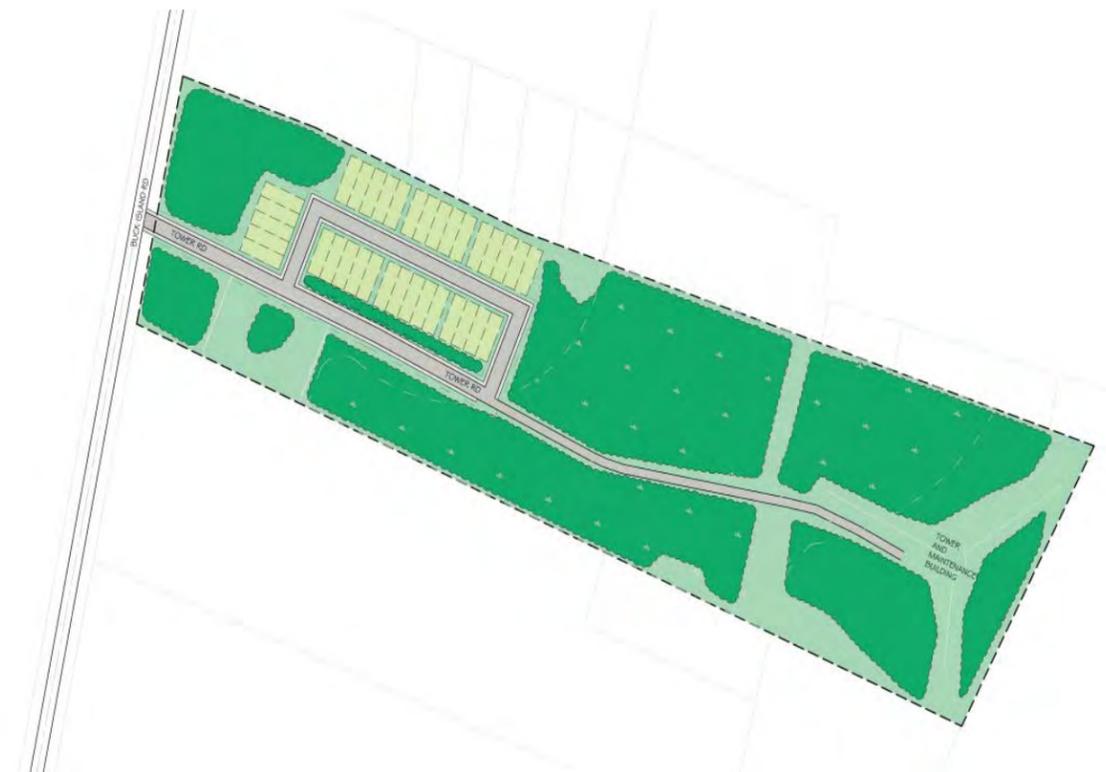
Conceptual infill residential on Tower Road shows 34 new lots tucked in an 18.3 acre property. The existing woods, wetlands, and significant trees are all preserved.
